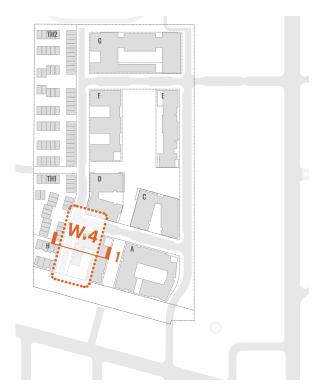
West Street North, Section 1 \*see "Figure 5.15.2: West Street North, Plan Enlargement", Site Plan W.1
